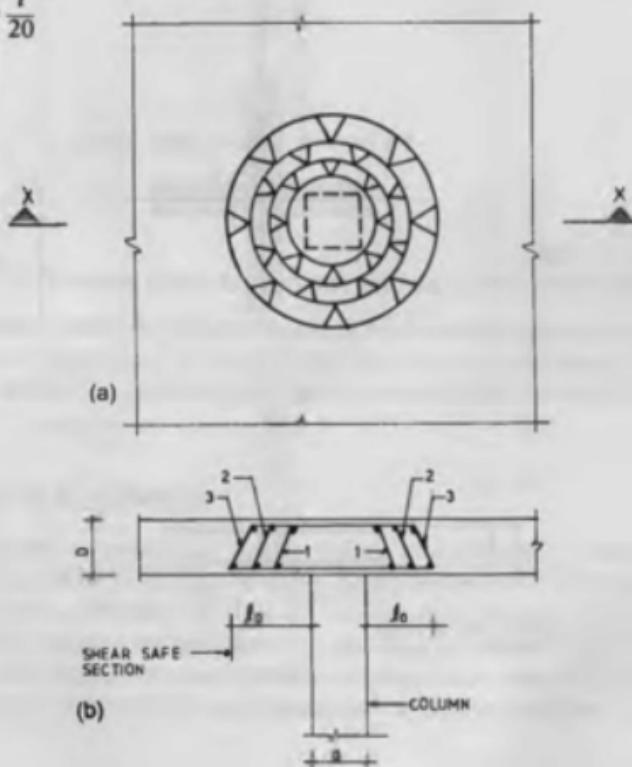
Flat plate with shear head of steel bars (without column capital). (a) Plan; (b) Section X-X.
